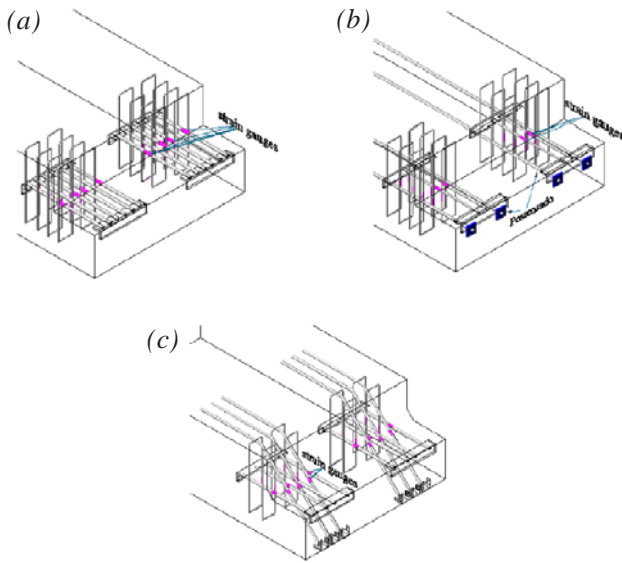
Configuration of reinforcement and instrumentation of specimens: (a) specimen E1; (b) specimen E2; and (c) specimen E3
